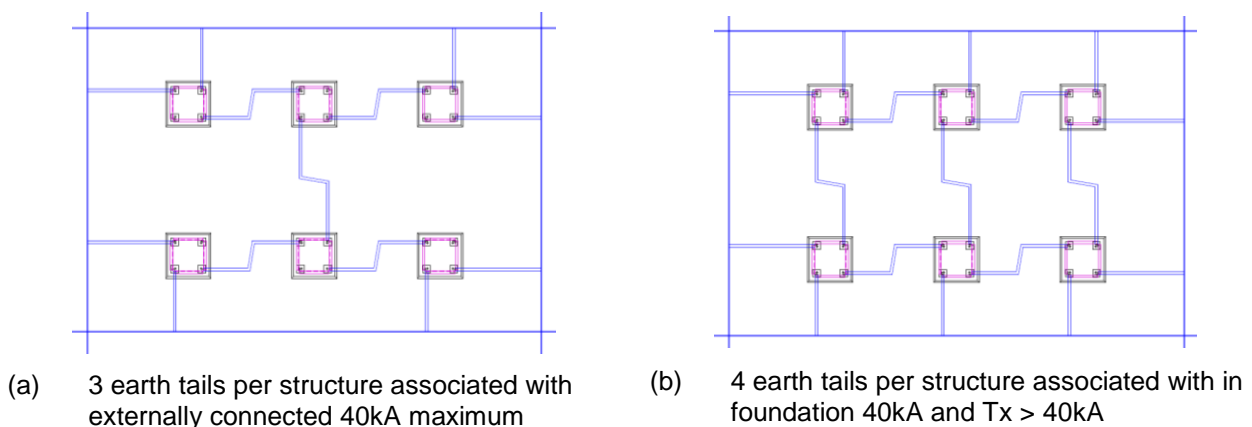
Typical arrangement for 3 and 4 earth tails per structure
